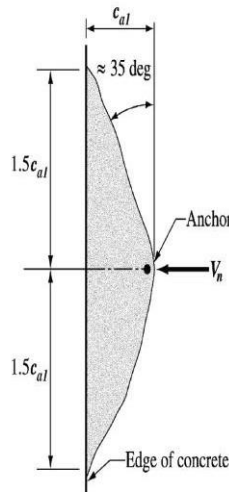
ACI349.2R (2007) D.4.2.2 Breakout cone for Shear
